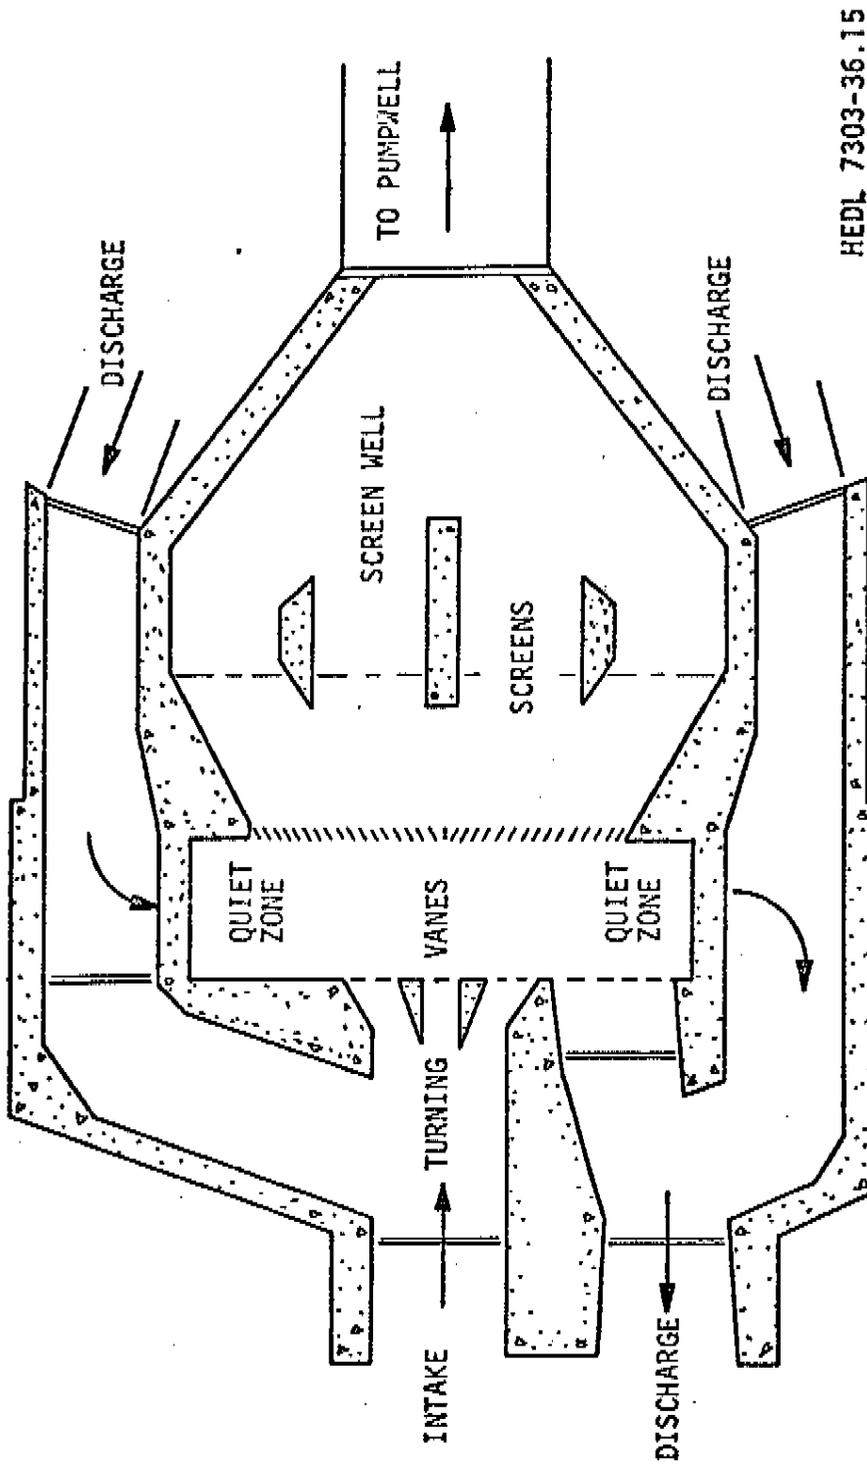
Plan View of Screenwell Used at Huntington Beach Steam Electric Plant.
